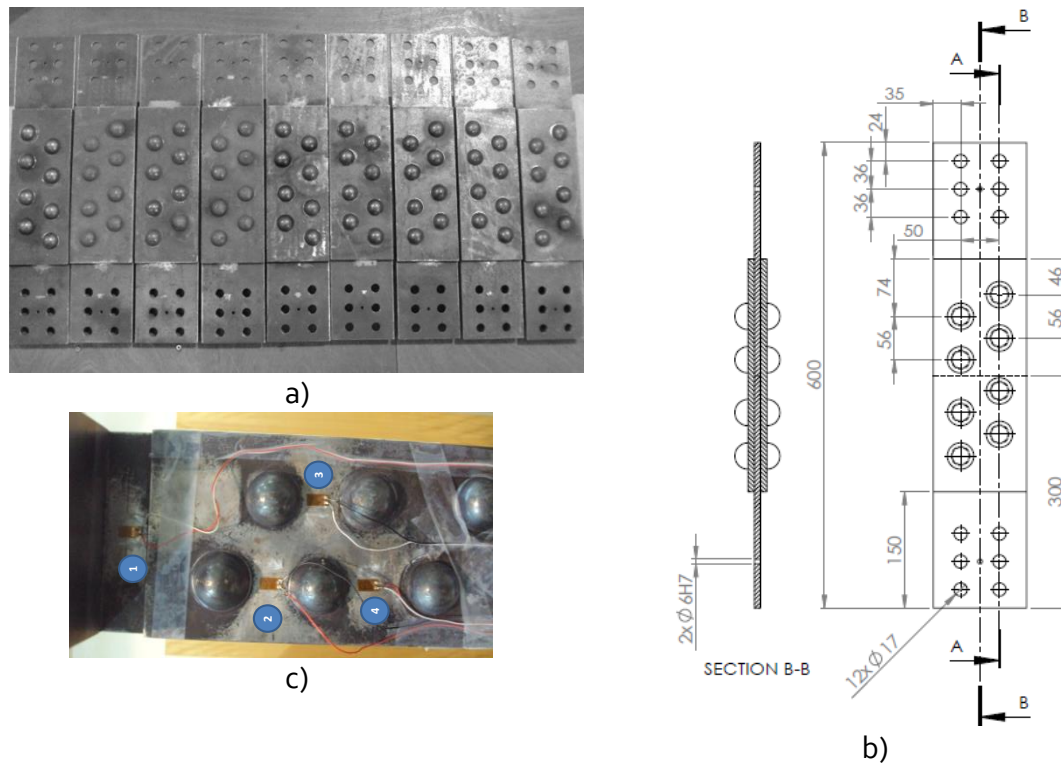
Double line double shear riveted splices, R₃ series: a) photo of the complete series; b) geometry of the specimens (dimensions in mm); c) instrumentation of the specimen with strain gauges (3 specimens instrumented; remote strain gauge (1) (CEA-06-250UW-350) and local strain gauges (2), (3) and (4) (CEA-06-062UW-350).
